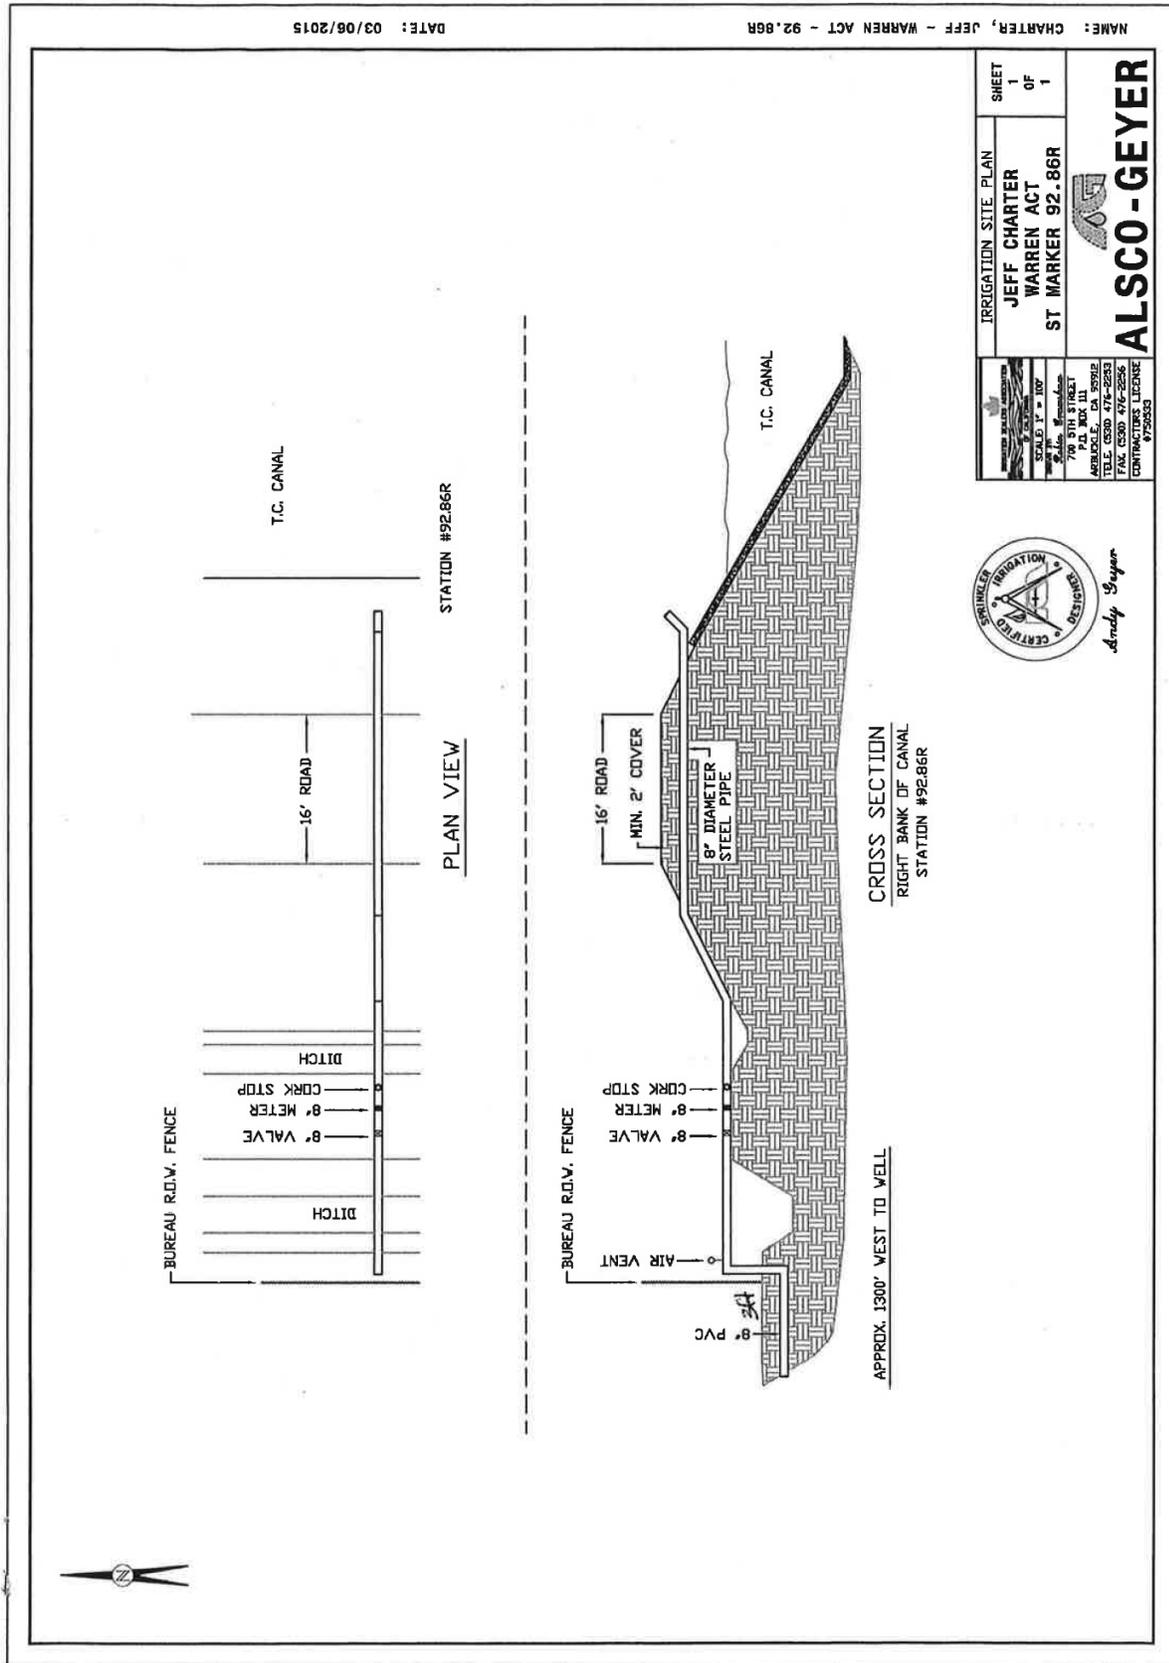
Cross-sectional view showing pipeline placement and elevations.
